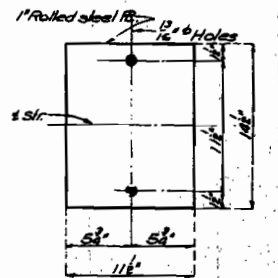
DETAILS OF BEARING CASTINGS FOR CONTINUOUS SPANS
